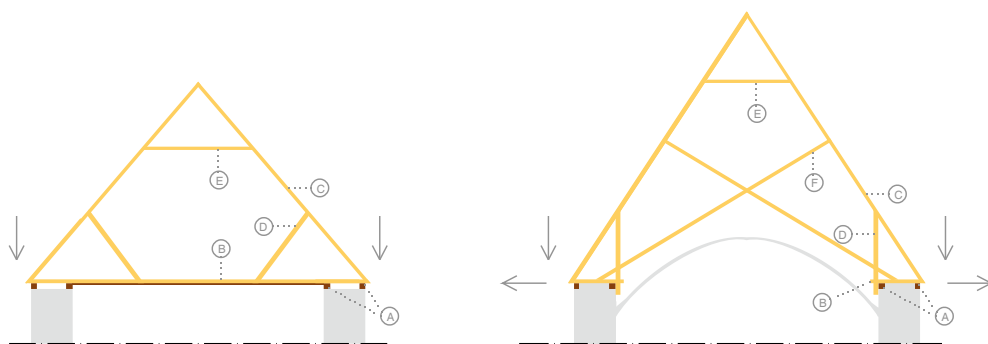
The structural principle of a tie beam (or Romanesque) roof truss and a rafter foot roof (Gothic) truss without tie beams. (a) Wall plates; (b) tie beam/sole piece; (c) rafter; (d) strut/ashlar post; (e) collar beam; (f) scissor beam
